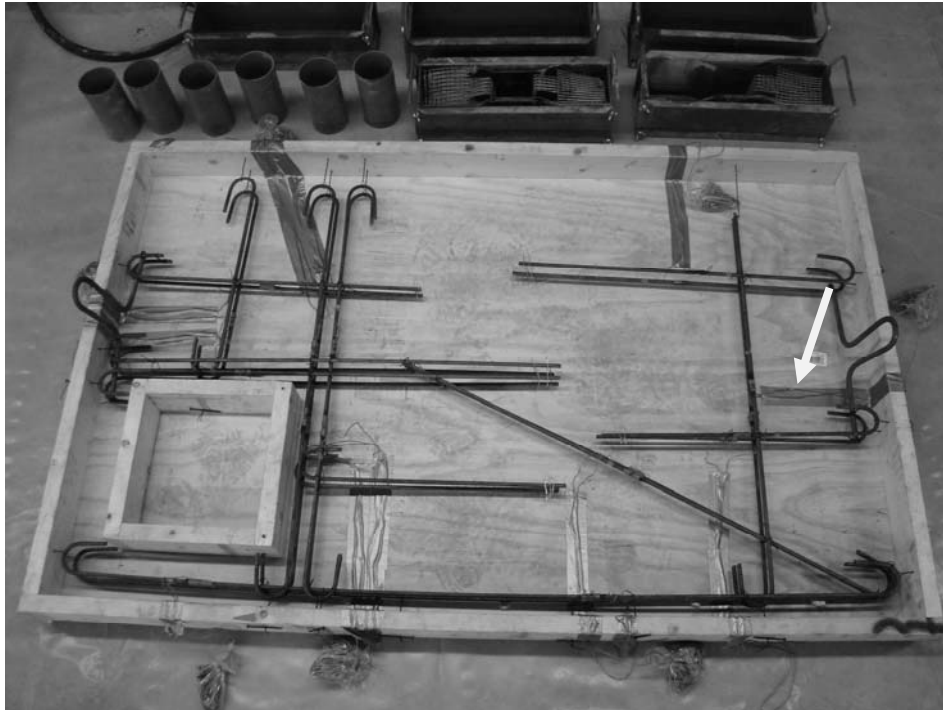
RC test specimen and material testing forms before casting. Arrow shows rebar hooks cast for lifting purposes
